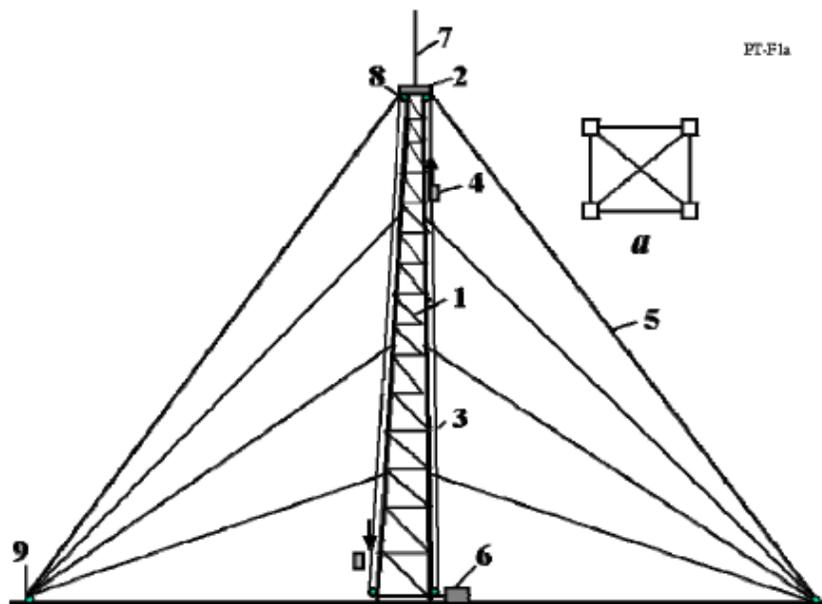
Solid optimal space tower (mast) of height 3 - 100 km. (a) typical cross-section of tower.
